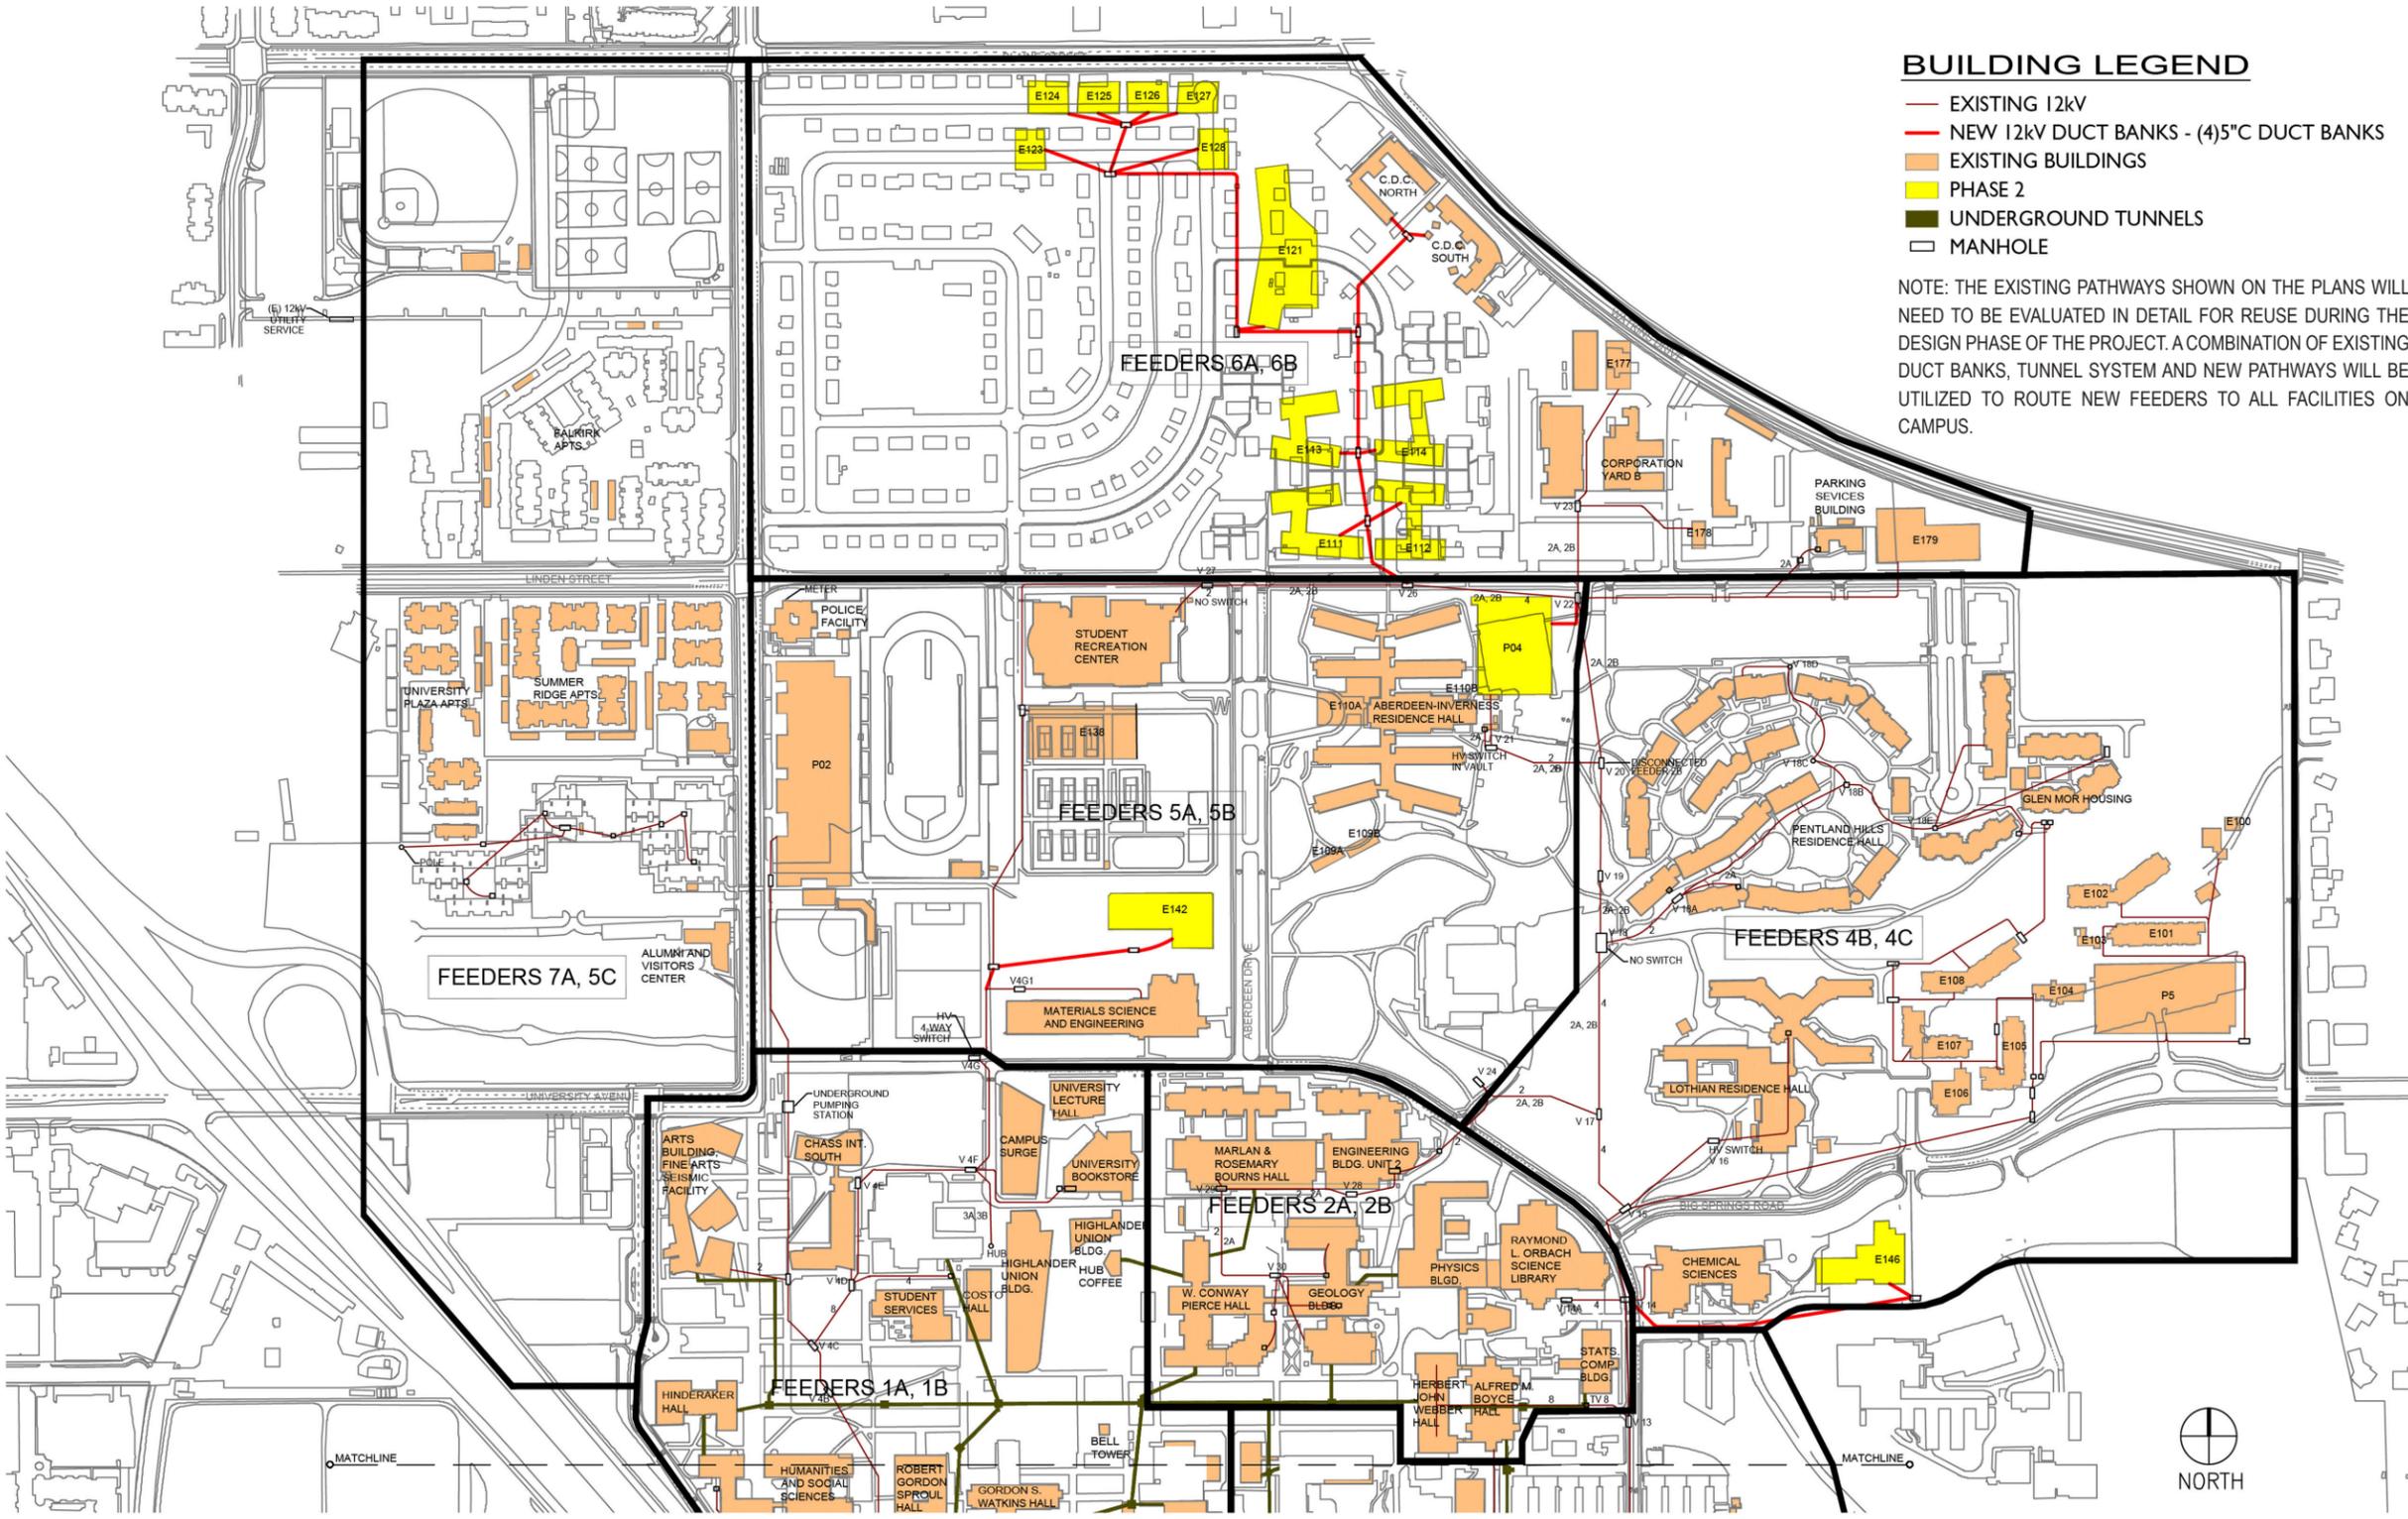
Phase 2 Buildings Electrical Site Plan–North
